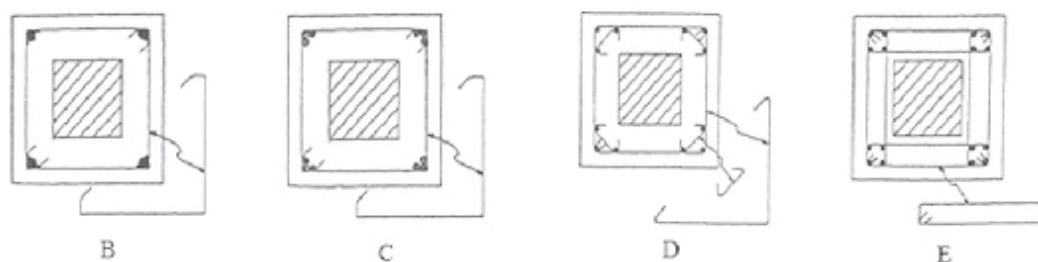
Reinforcement Pattern for RC jacketing of RC columns
